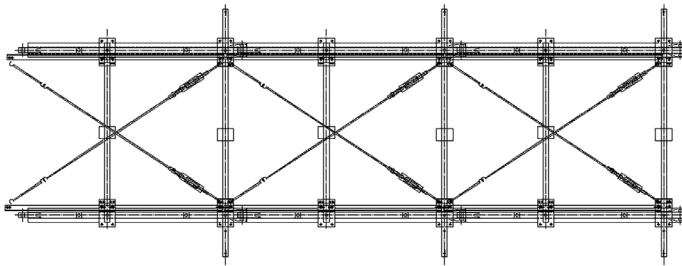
Floor plan drawing of Sway Brace assemble
